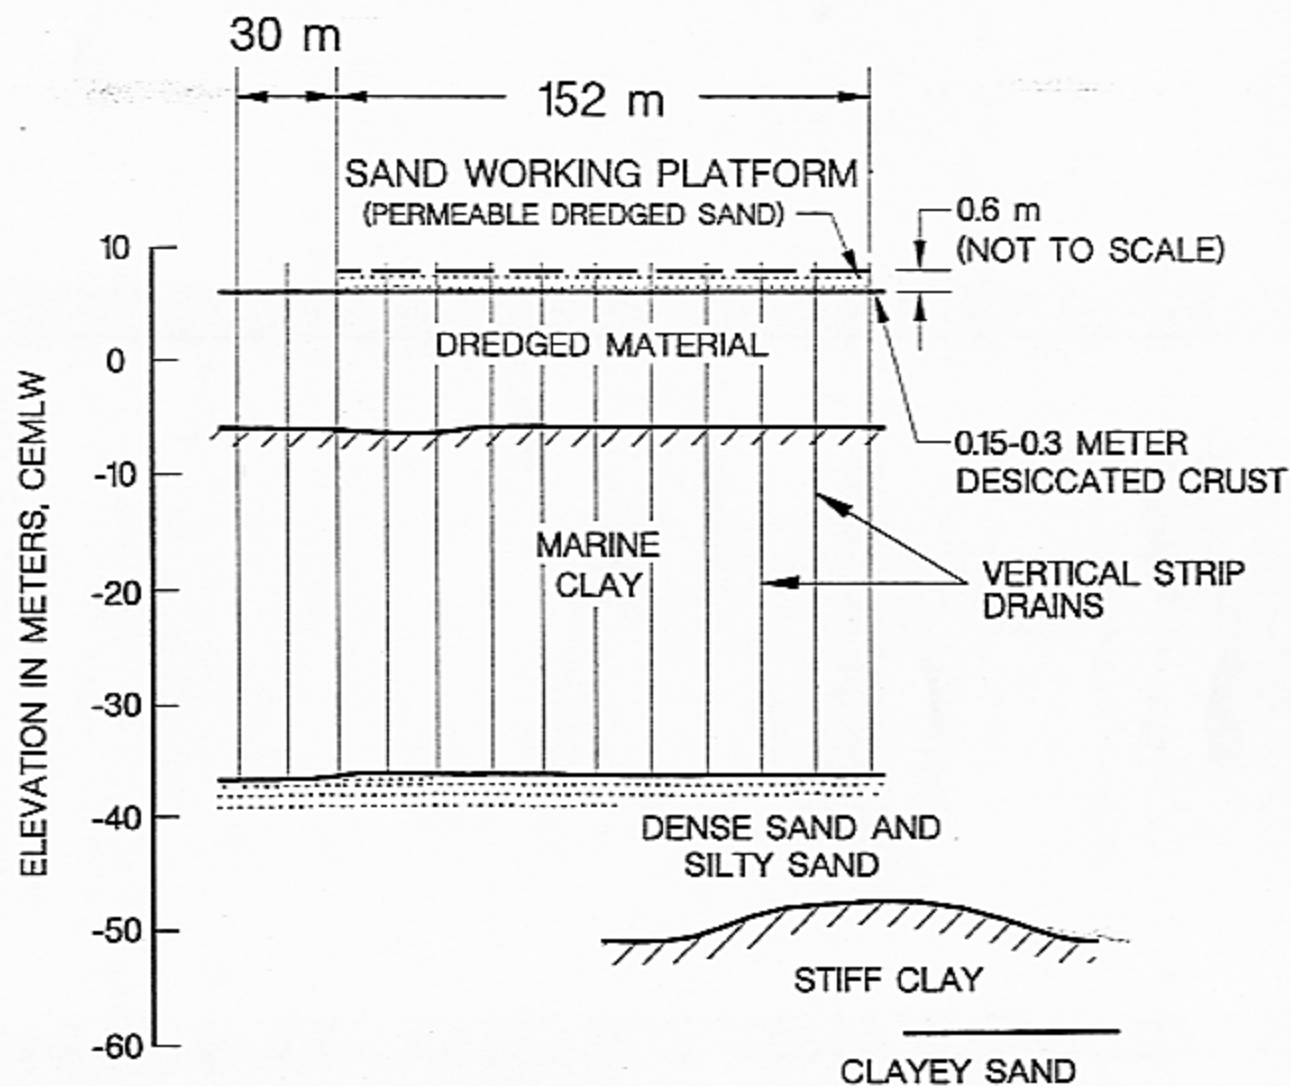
Subsurface Profile Near Vertical Strip Drain Test Section
